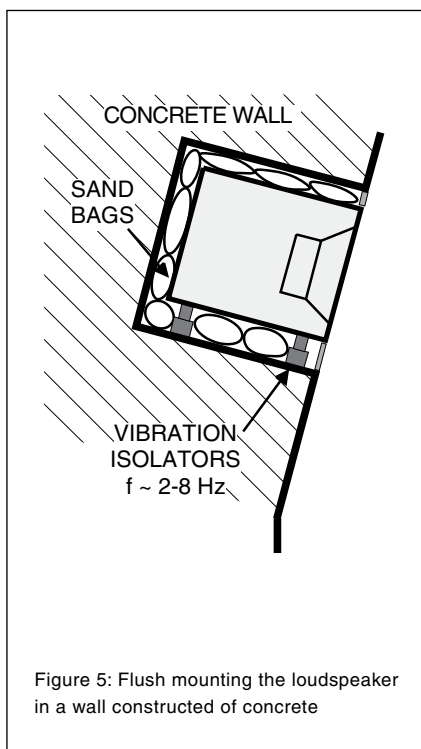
Flush mounting the loudspeaker in a wall constructed of concrete
